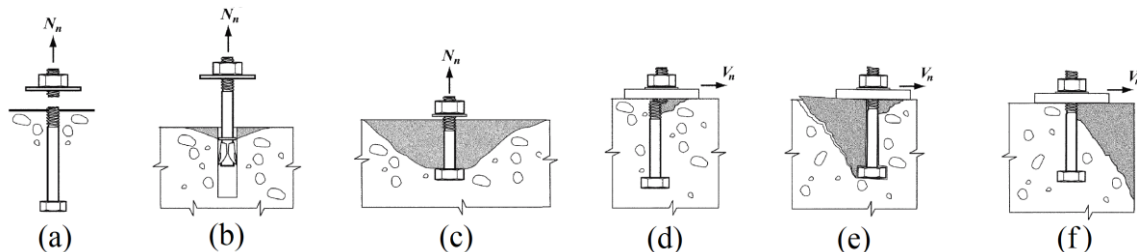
Anchor failure modes: (a) tensile rupture, (b) pull out in tension, (c) bond failure, (d) shear failure, (e) pry out failure, and (f) concrete breakout [19]
